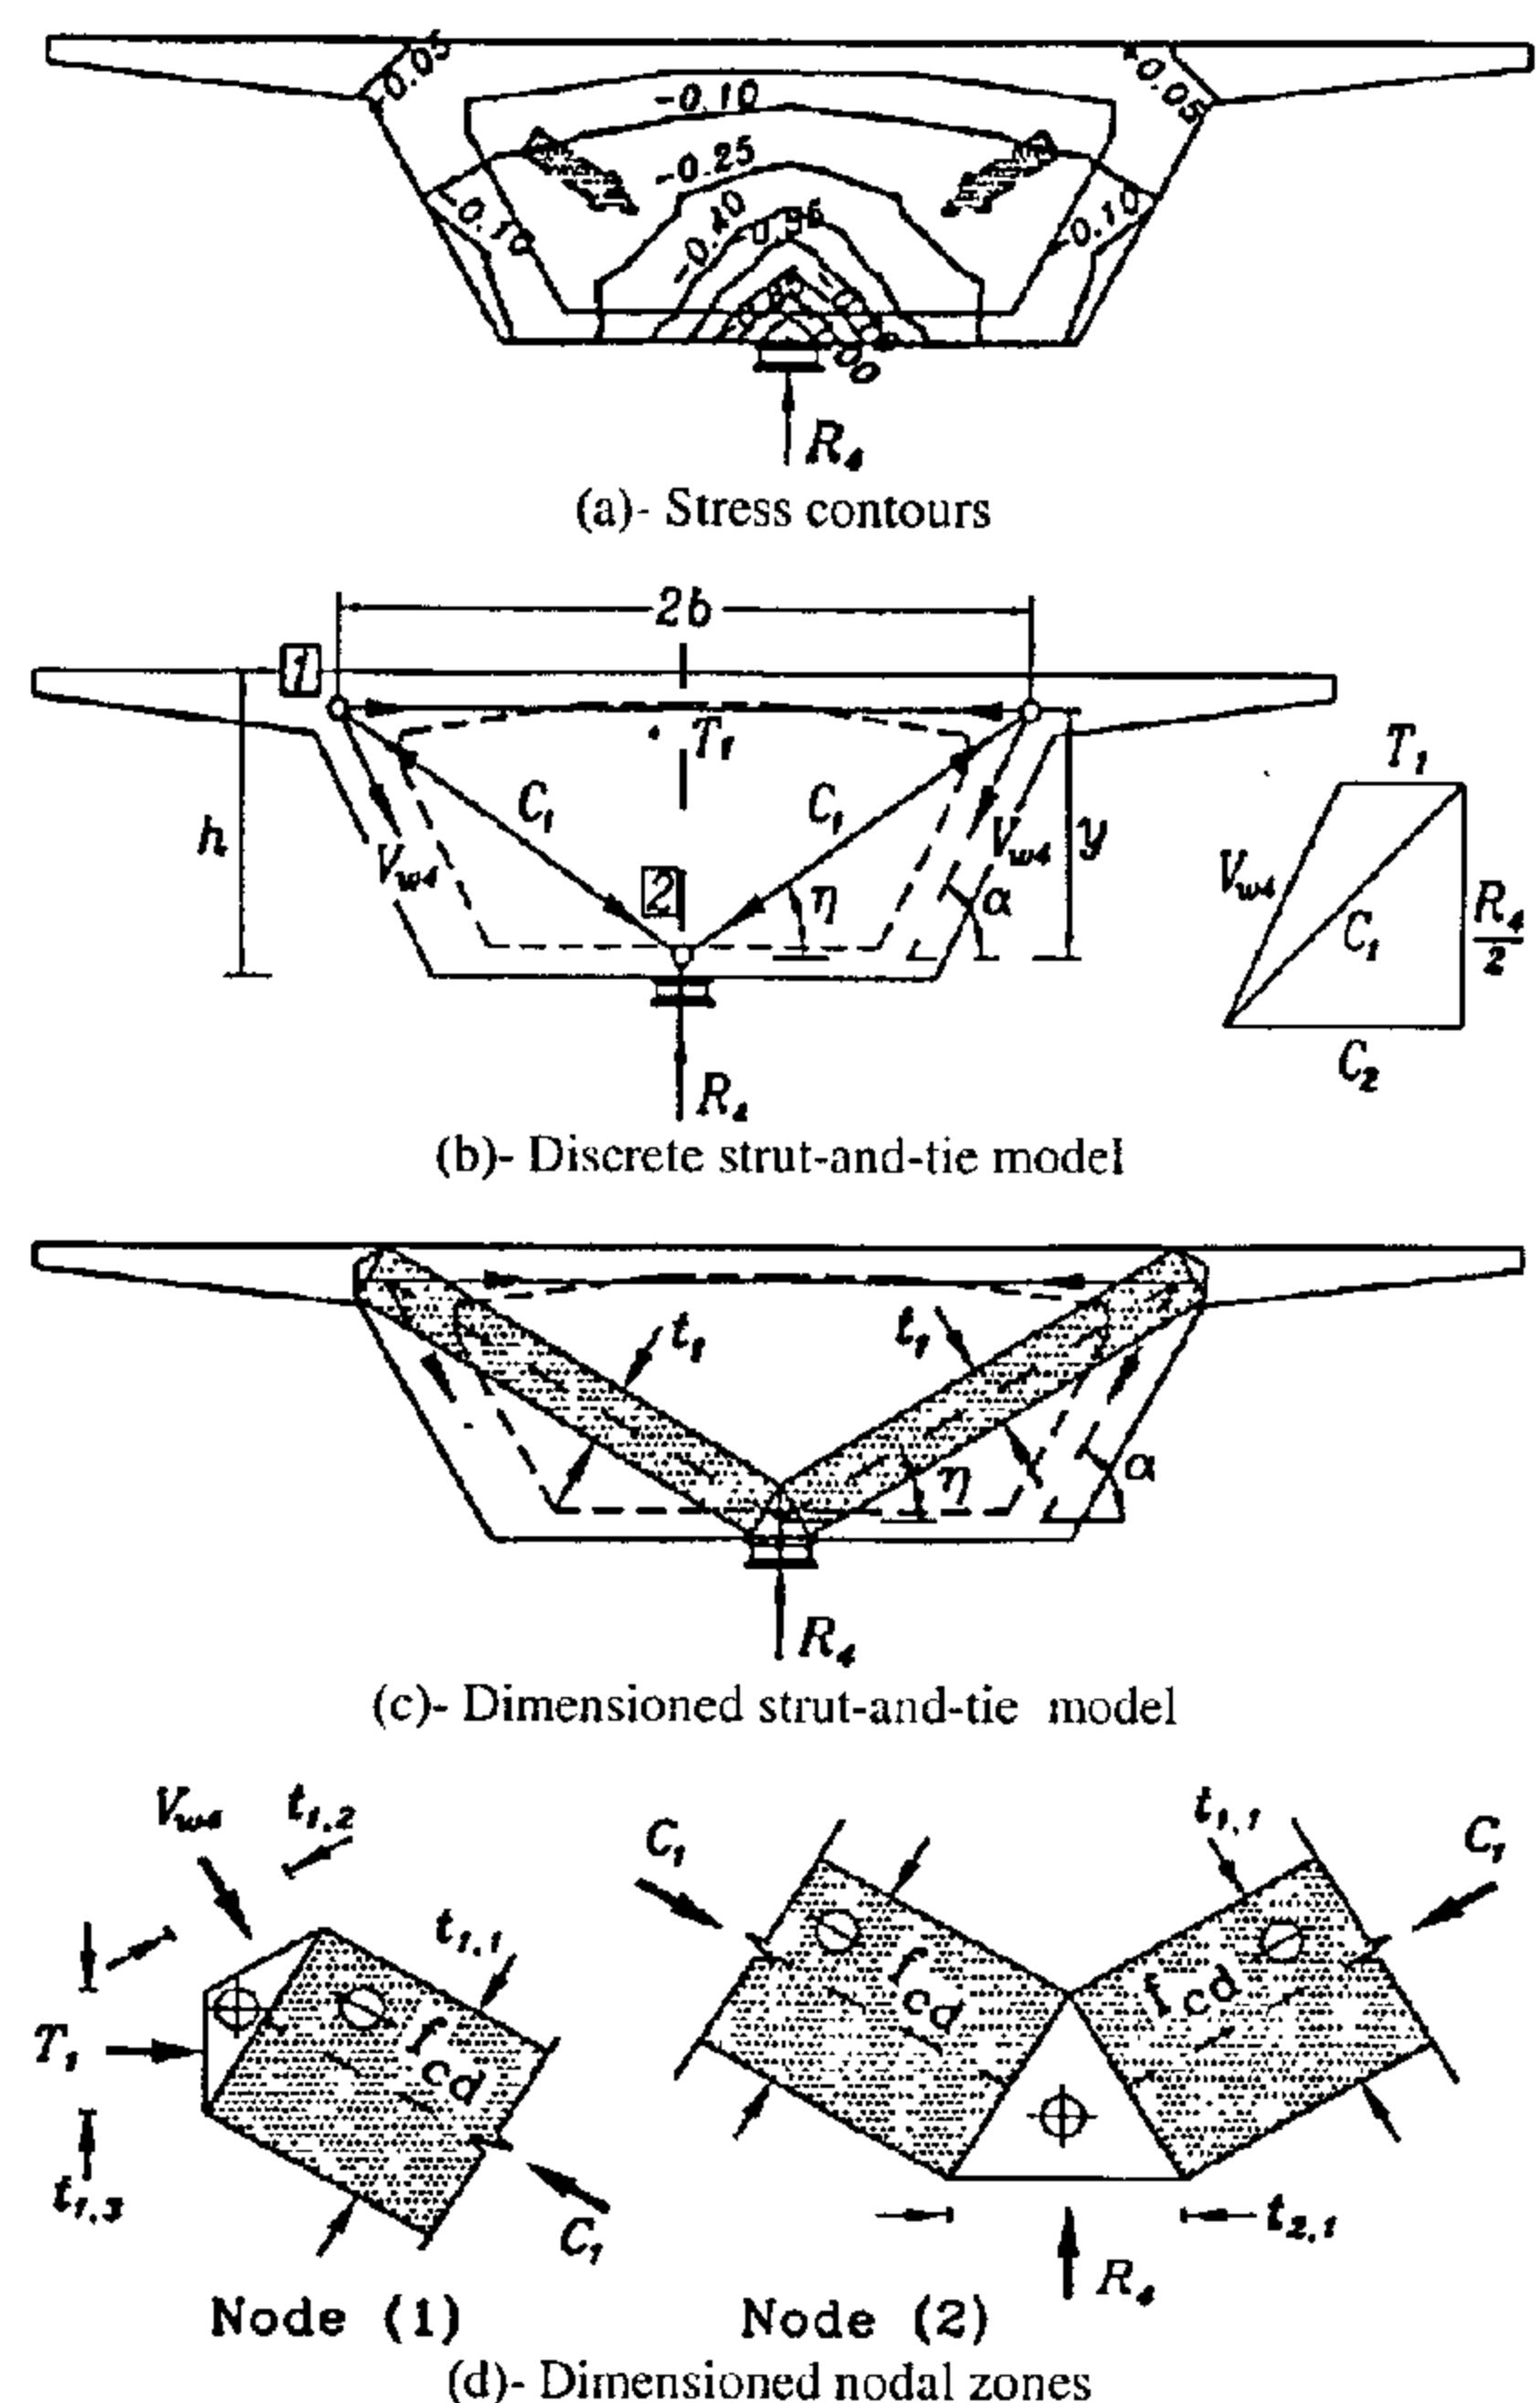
Strut and tie model for a box-girder diaphragm under temporary jacking
